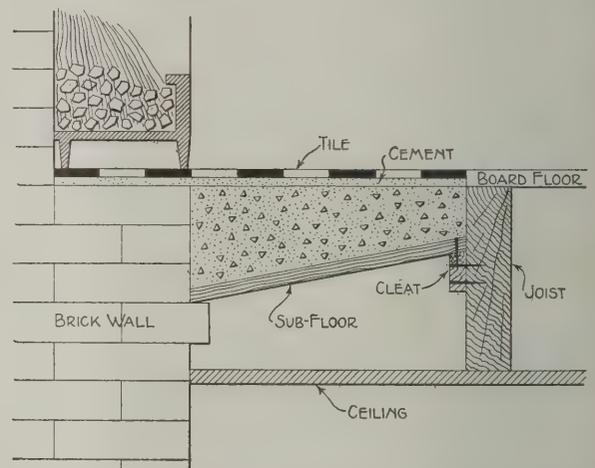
Another Method of Constructing Foundations for Tile Hearth
